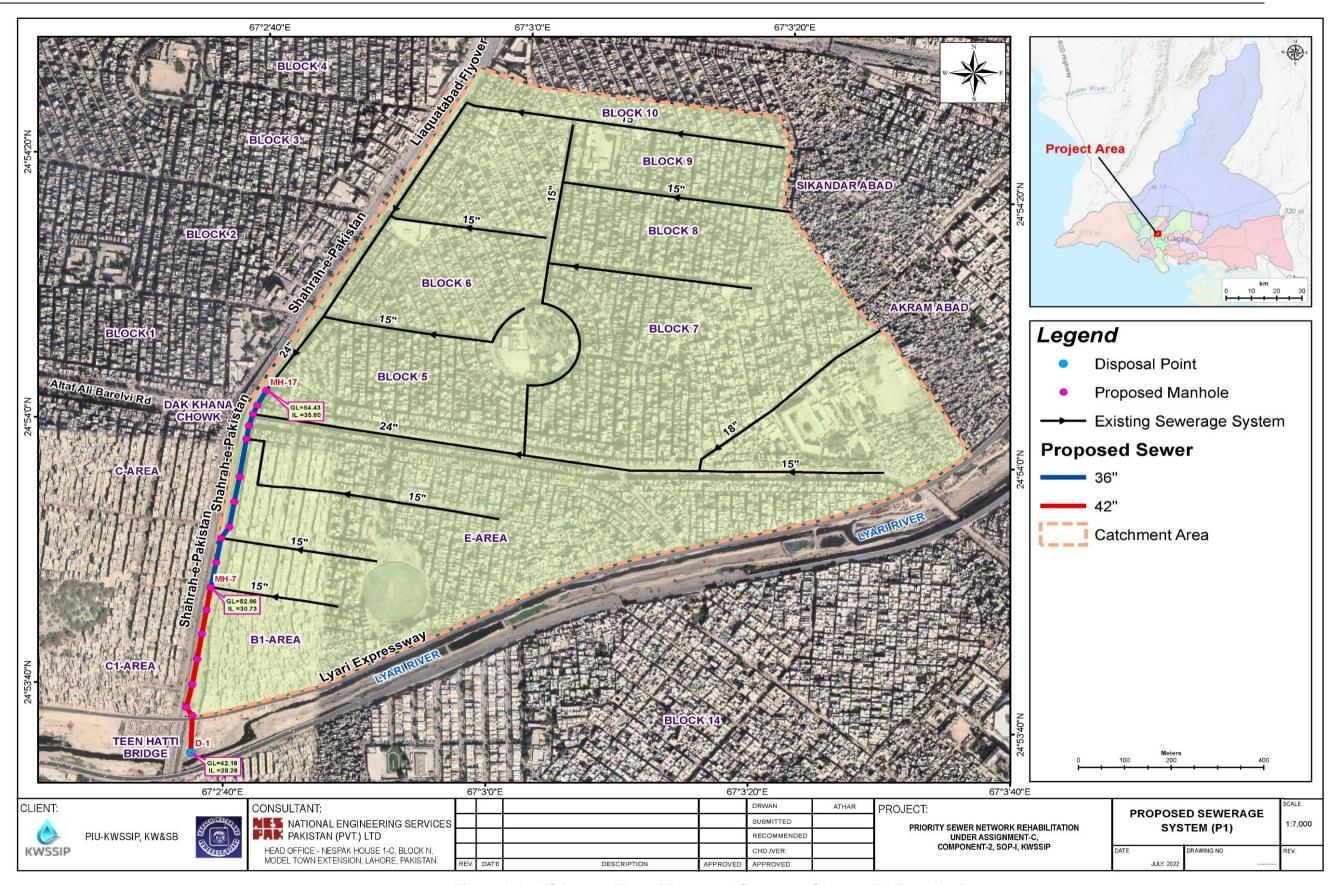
GIS Layout Plan of Proposed Sewerage Scheme P1-Teen Hatti
